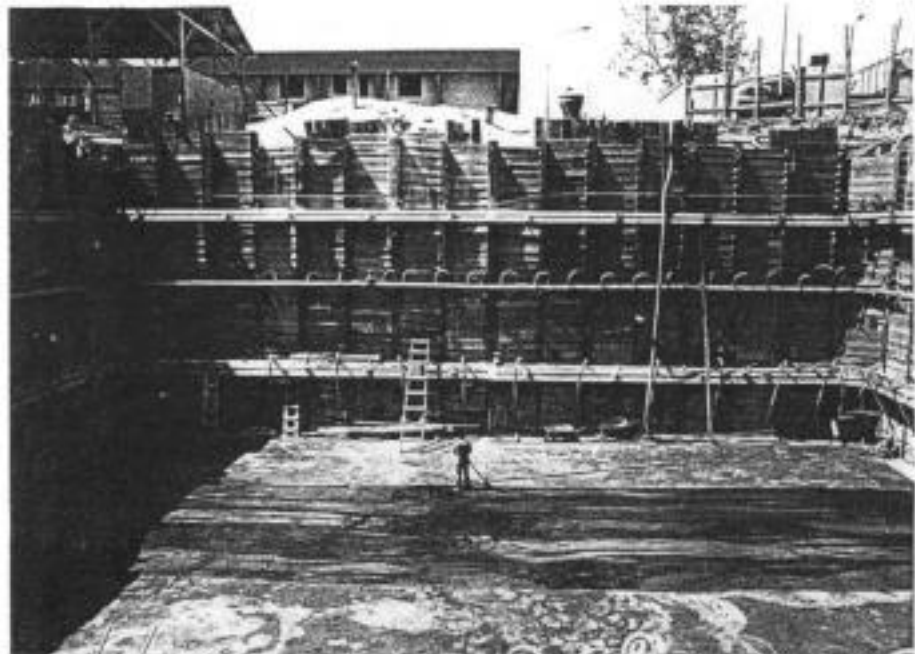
Berlin wall method using steel soldier piles and horizontal timber laggings with wellpoint dewatering for a sewage pumphouse at Al-Khobar, Saudi Arabia (courtesy of Bauer)
